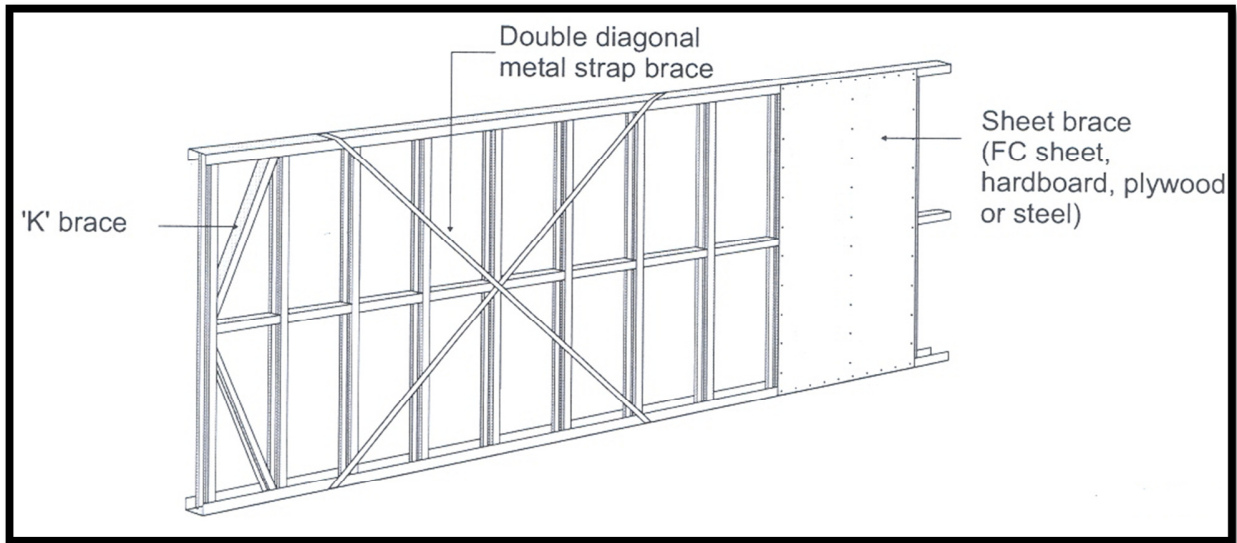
Bracing systems in a steel framed house (SASFA, 2010)
